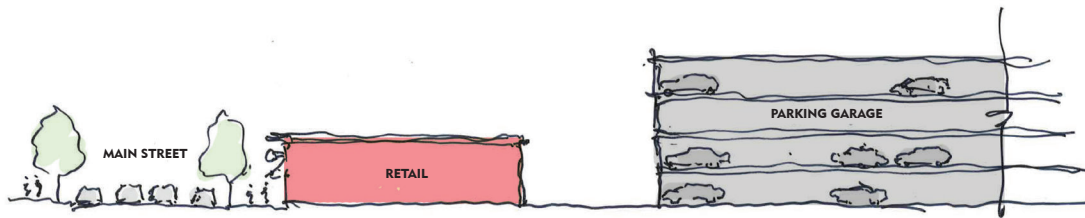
Mixed-Use Liner to Freestanding Parking Structure
